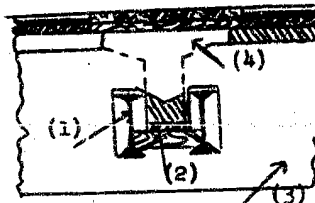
Temporary Repair of a Damaged Cross Beam by Placing a Wooden Support Under It
